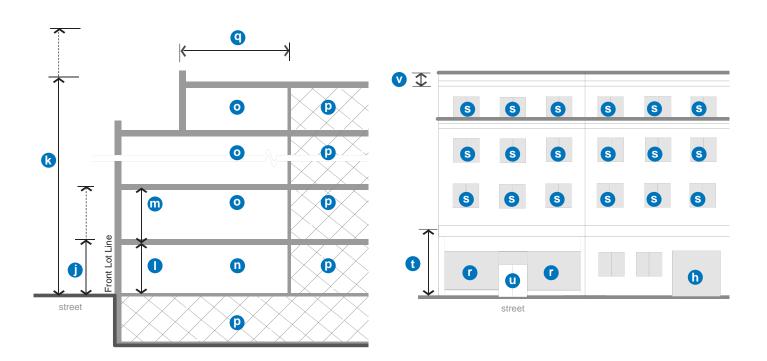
(2). Limited Bay Building: Height & Use Requirements.
